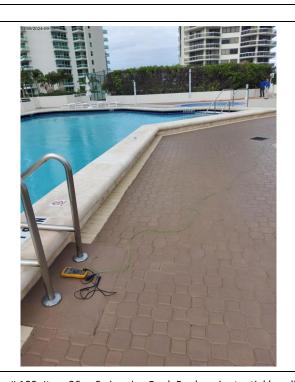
Item 26.a. Swimming Pool. Pool equipotential bonding: Failed test.
